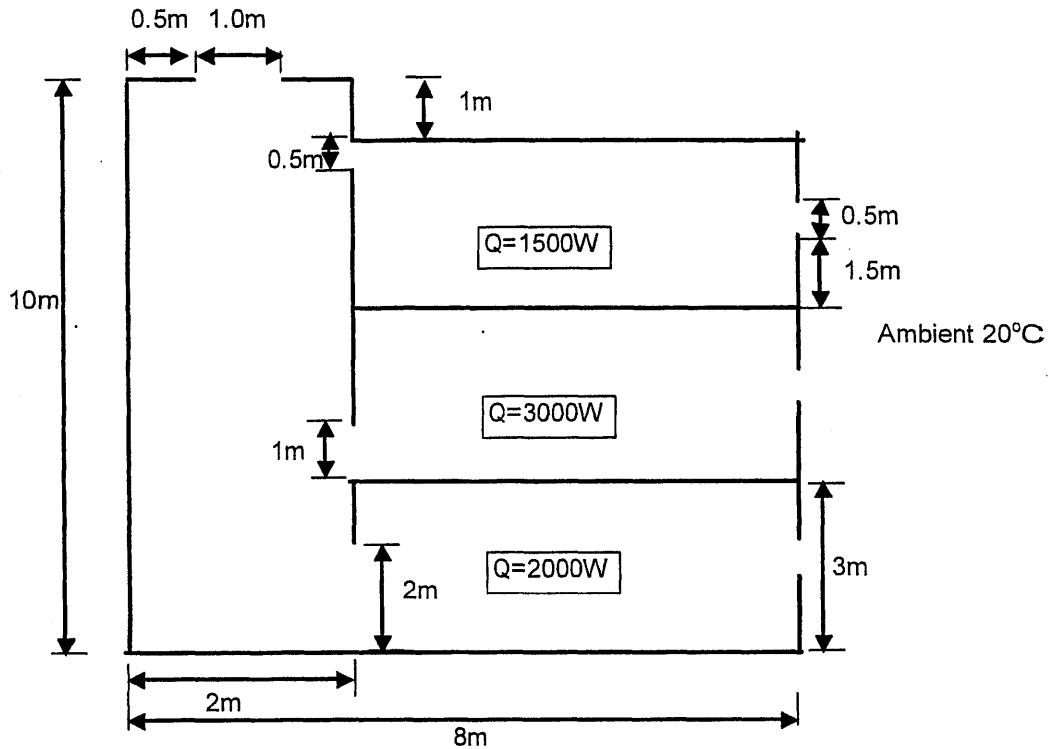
Sketch of the 3-floor naturally ventilated building with a stairwell
